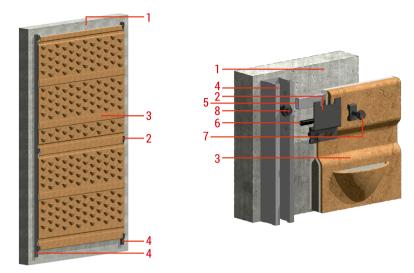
Axonometry and detail of the fastening node. Legend: 1. Load bearing layer; 2. Stainless steel fixing plate; 3. Panel; 4. Mullion; 5. Stainless steel fixing bar, box profile 20 x 9.5 mm (2 mm thick); 6. Driplines (irrigation system); 7. Hammer-head screw for fixing the plate to the mullion; 8. Mullion fixing dowel (Source: own elaboration)
